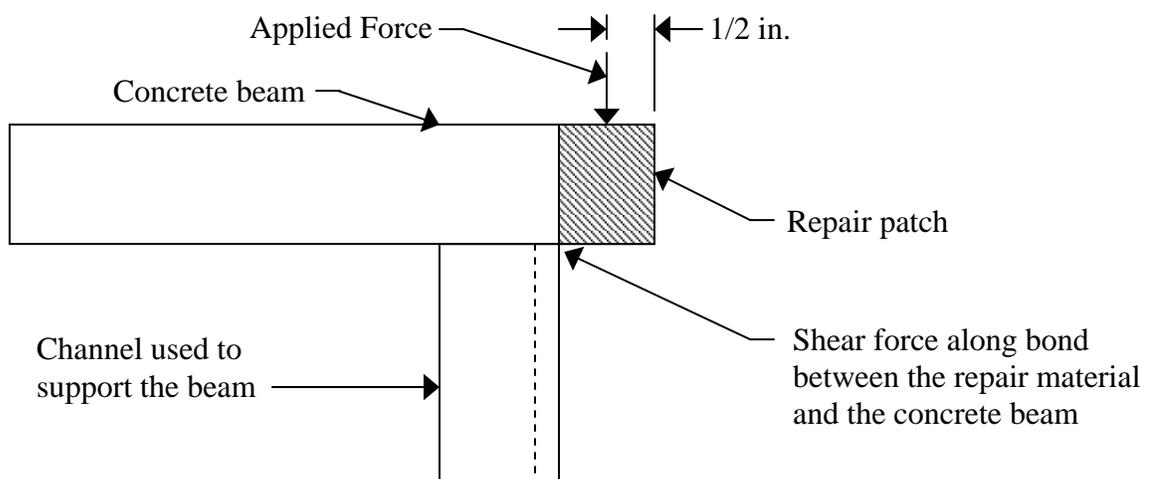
Push out shear test specimen supported at the beam centerline.
